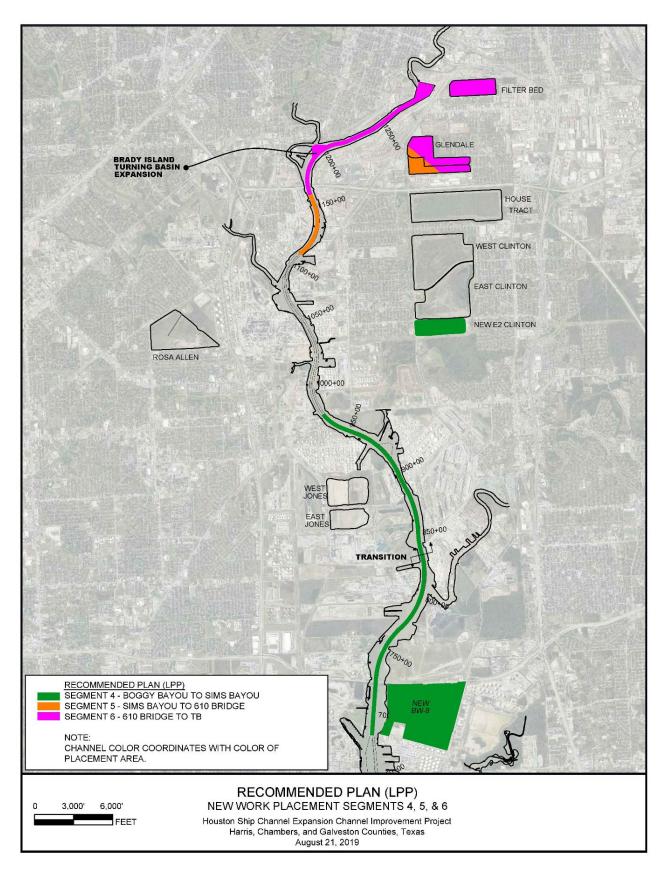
Recommended Plan (LPP) New Work Placement Segments 4, 5 &6
